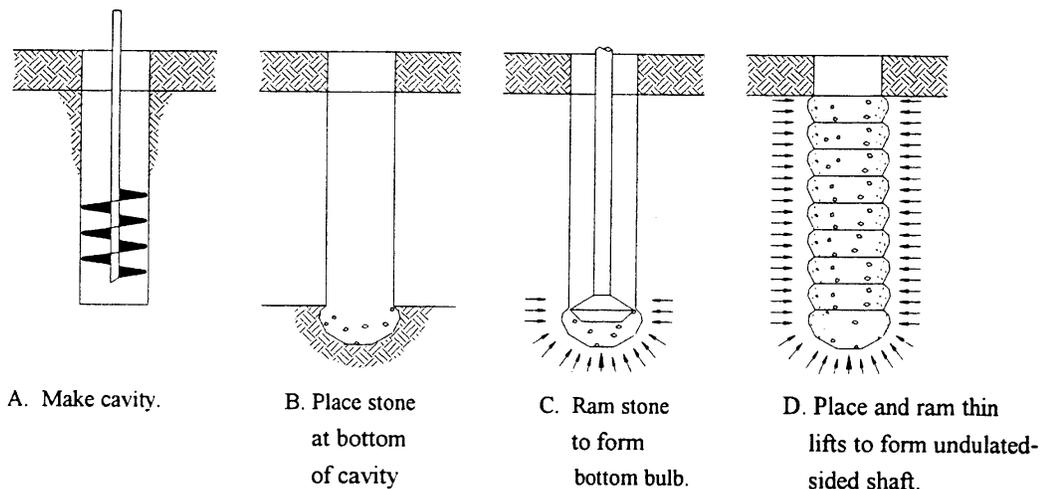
Summary of the Geopier® installation process. (Geopier®, 2003)
